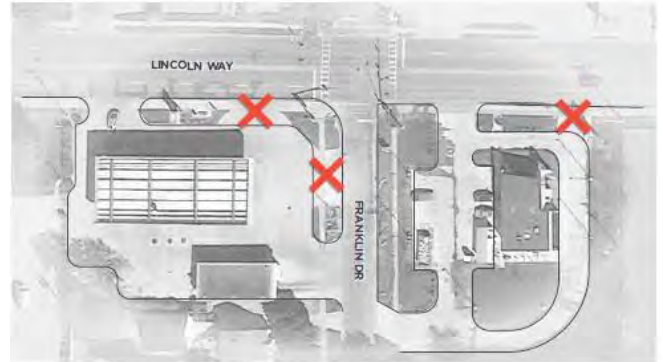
Remove redundant driveways and create shared access driveways. (Source: Ames Lincoln Corridor Plan)
